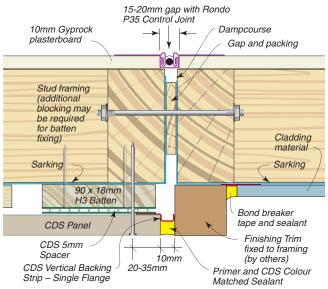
Typical Detail Junction with Fibre Cement Cladding System – Plan View
